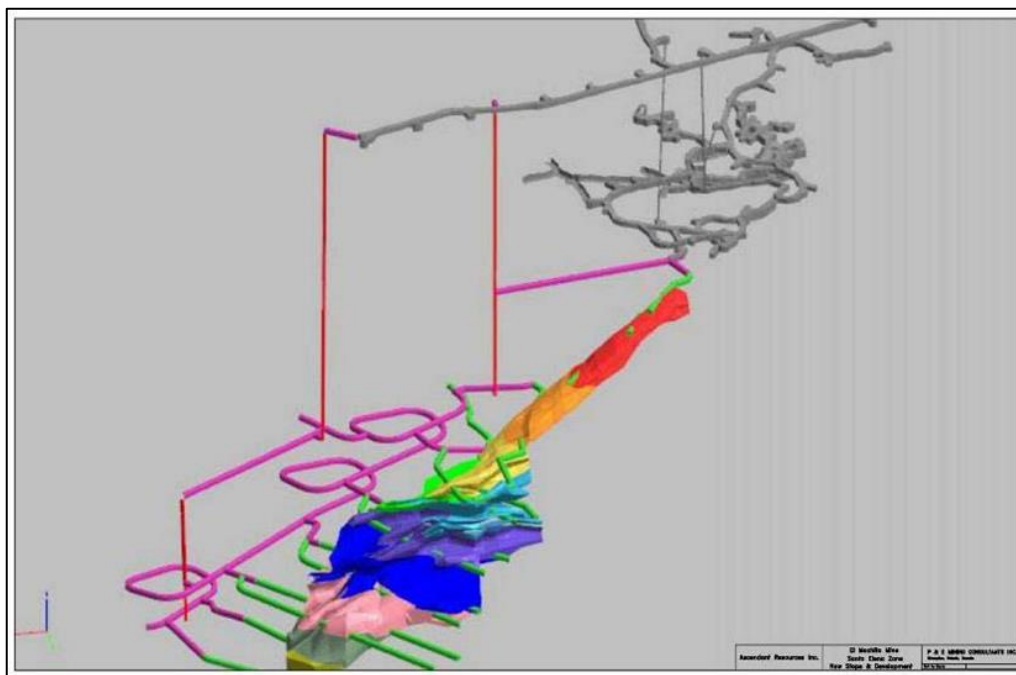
and Figure 16.23 are typical isometric views showing the proposed development plan and stope mining outlines for the Santa Elena zone and the Victoria zone.
